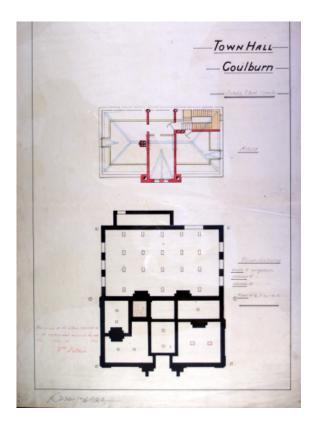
Foundation and attics/roof plans Source: Goulburn & District Historical Society
